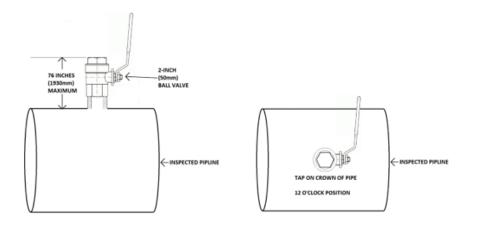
Typical Insertion Set-up: Profile and Plan View
